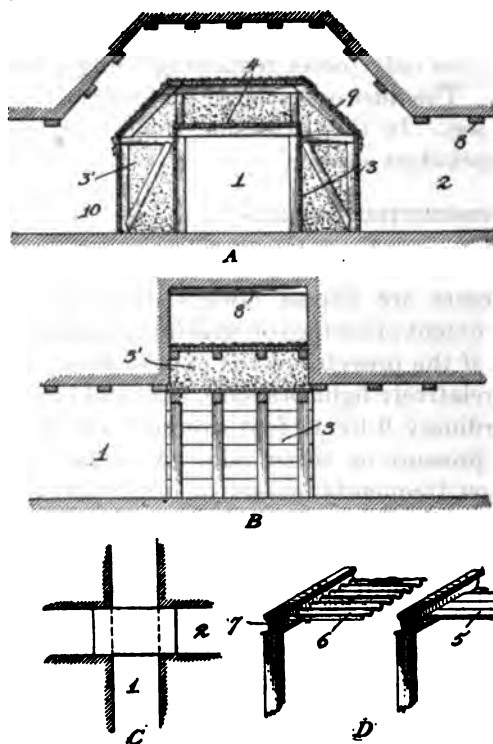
Rock-dust-protected overcast. A, longitudinal section; B, transverse section; C, plan view; D, details.
